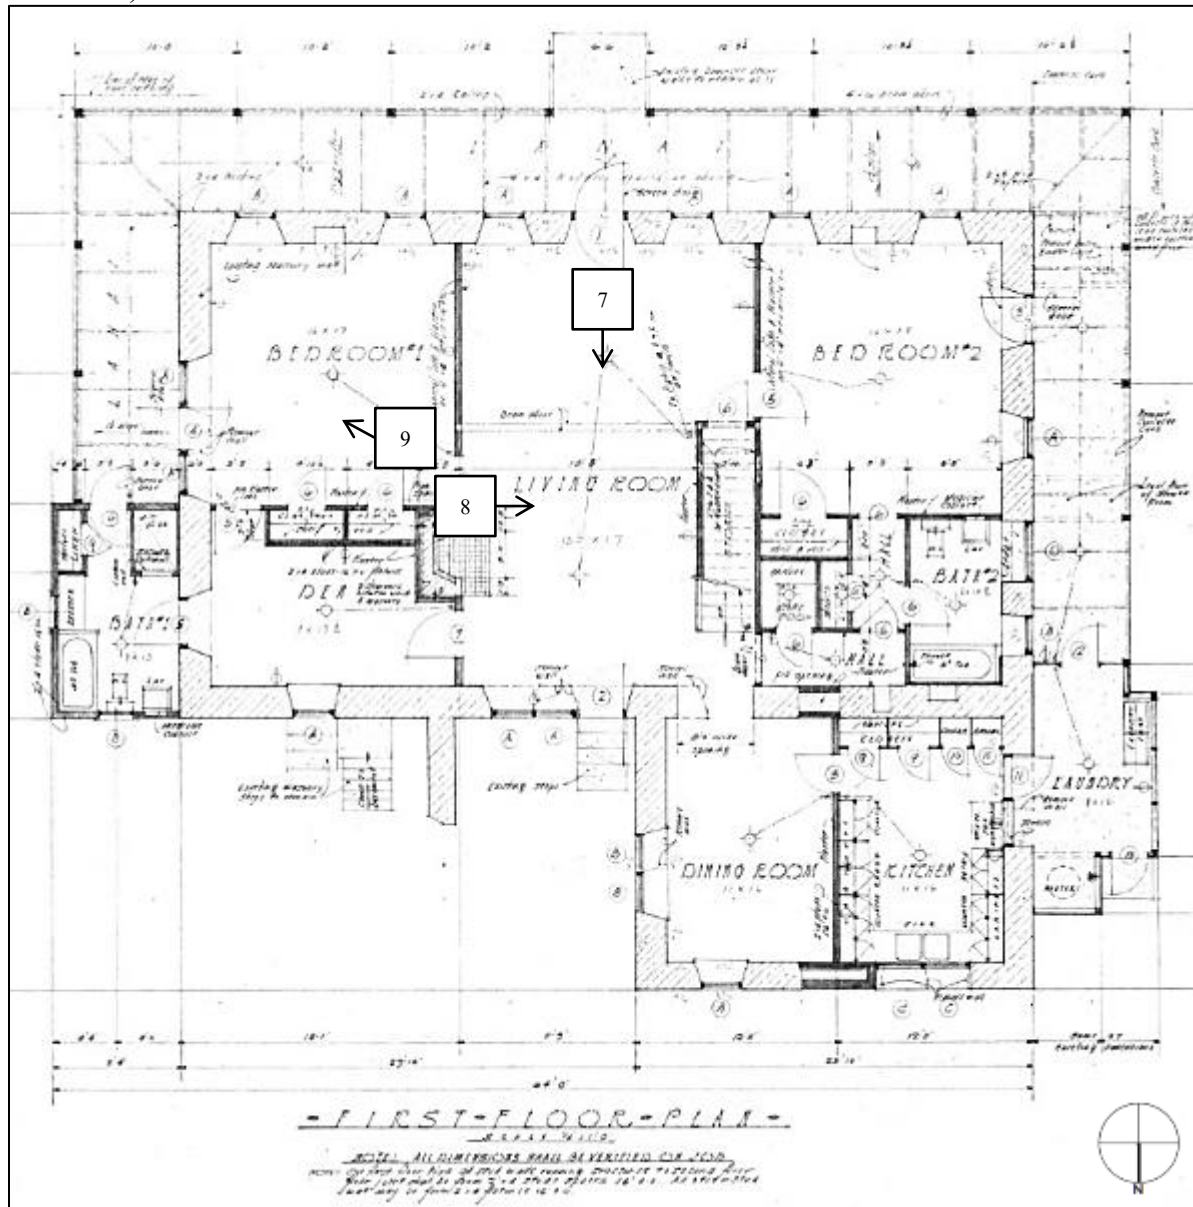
Interior photo key, first floor. (Floor plan: Wailuku Union Church; added graphics: MASON.)
